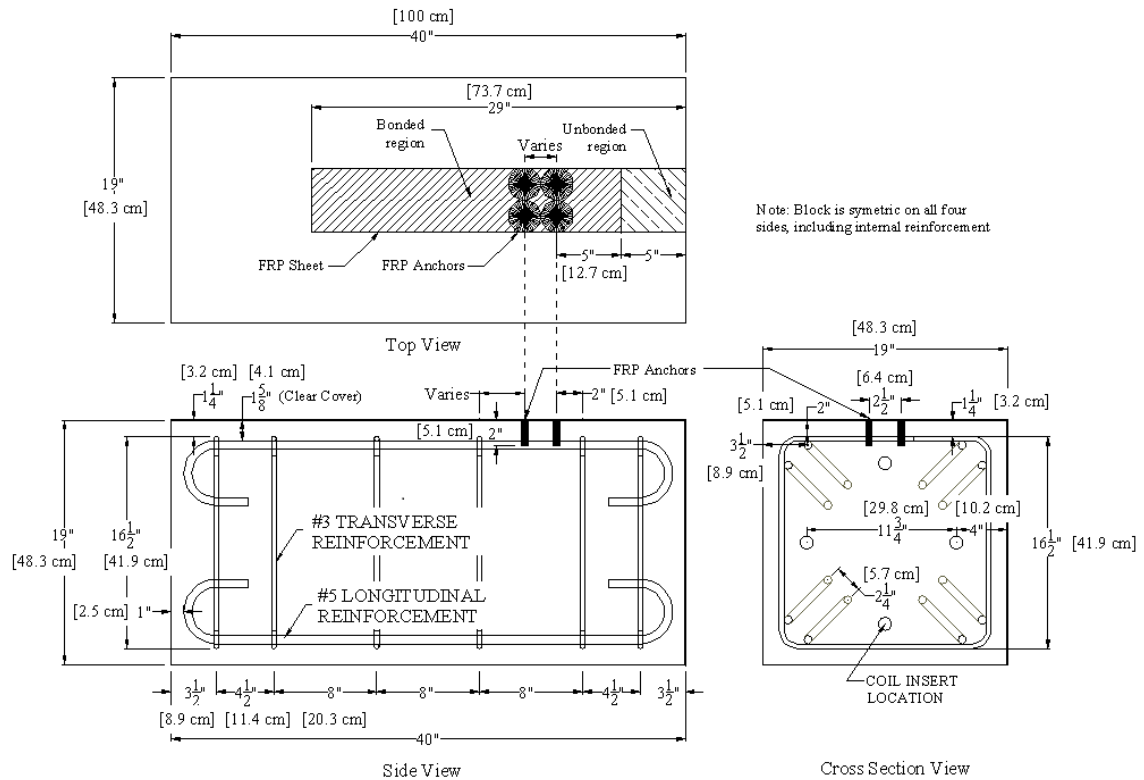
Concrete block geometry and internal reinforcement, and anchor location
